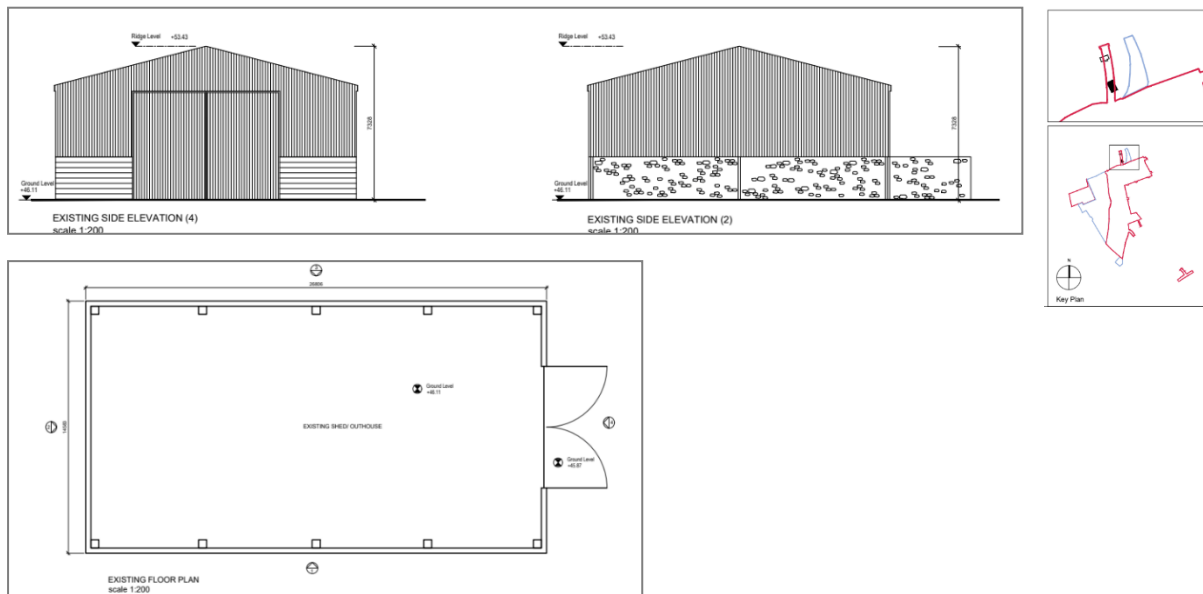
Drawing extract showing the existing shed outbuilding located off Flemington Lane which is proposed for demolition.
